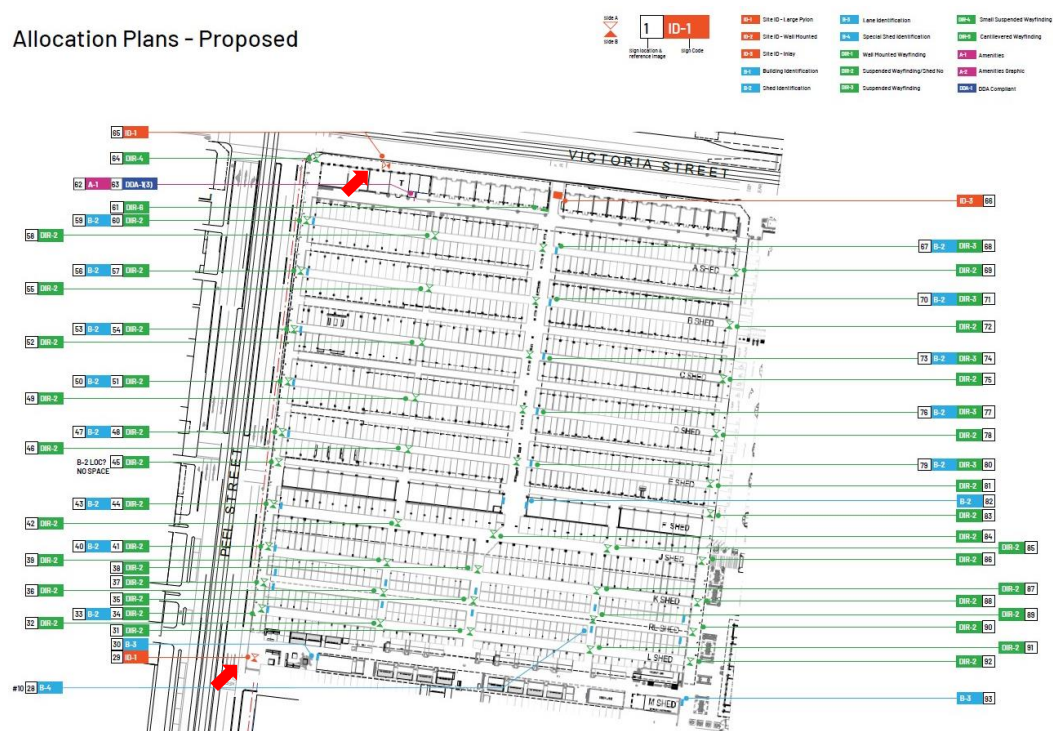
Proposed plans for placement of some of the signage; pylon locations are arrowed
